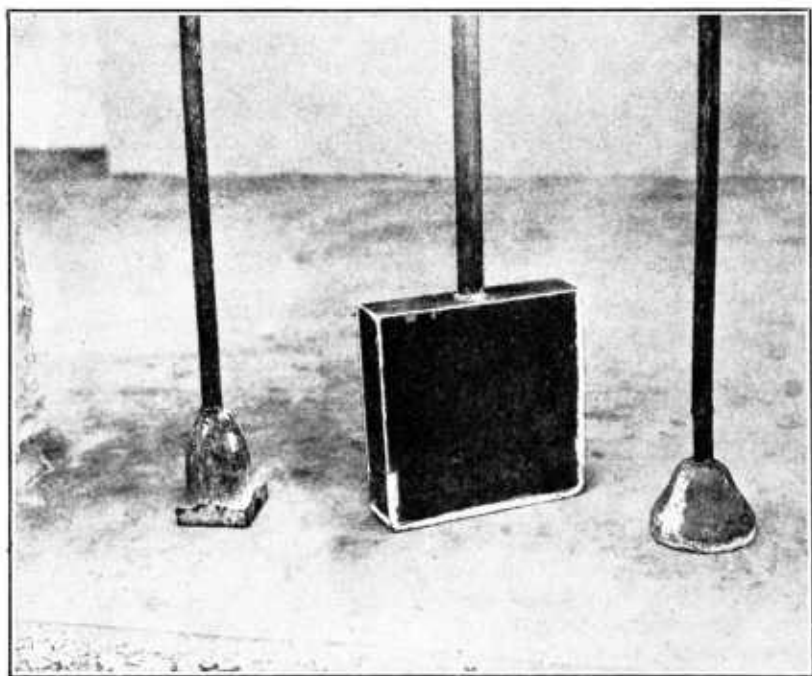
Rammers used in the construction of the house shown in Figure 2. (Courtesy of H. B. Humphrey.)
